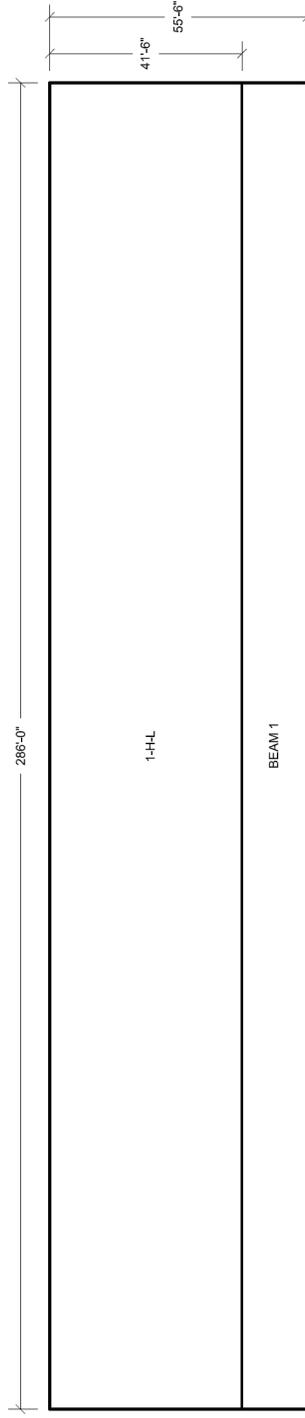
H.6-110-COOLING TOWER NORTH (AND SOUTH) WALL LOOKING SOUTH (NORTH)
